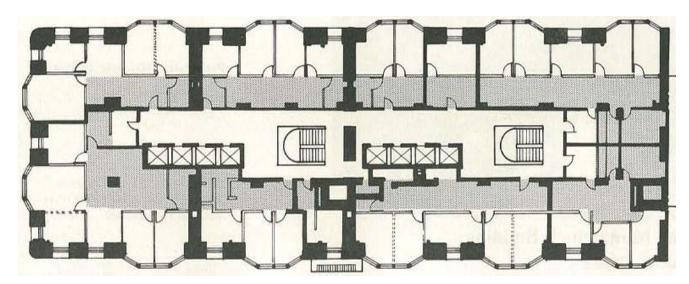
Corridor of a building act as connector between rooms (destinations)
